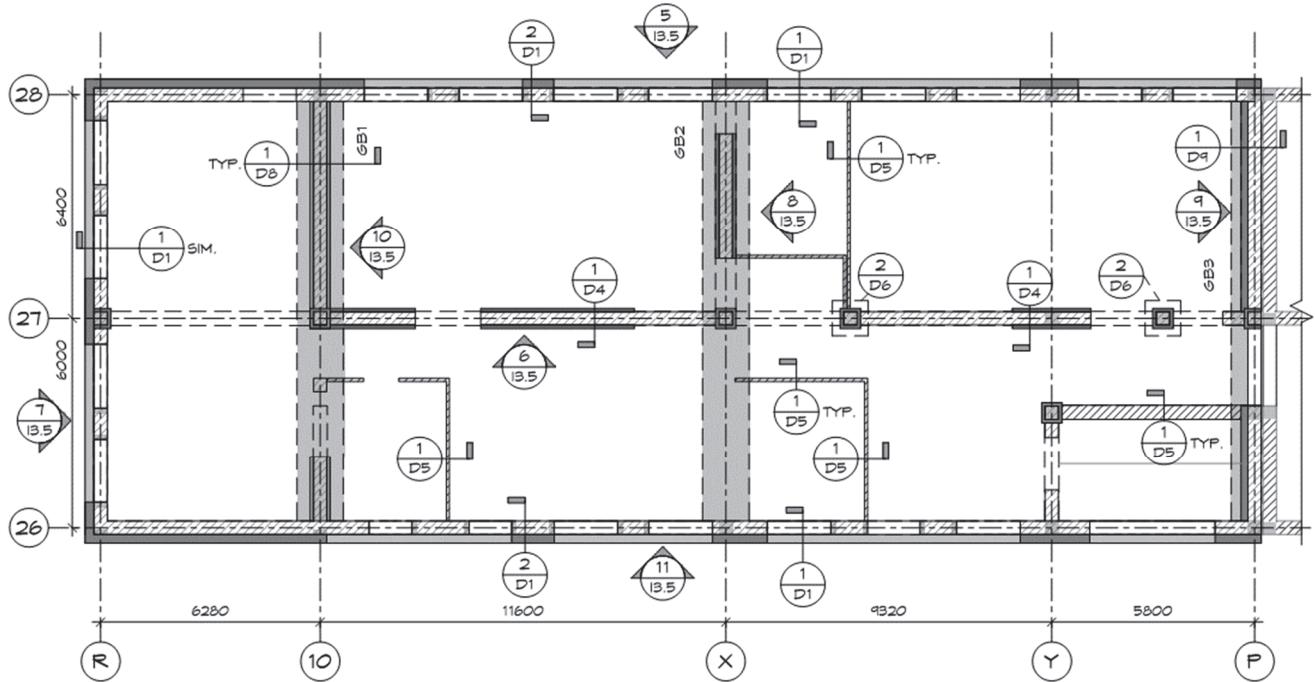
Plan showing transverse grade beams in CMCF Increment 3.5.
